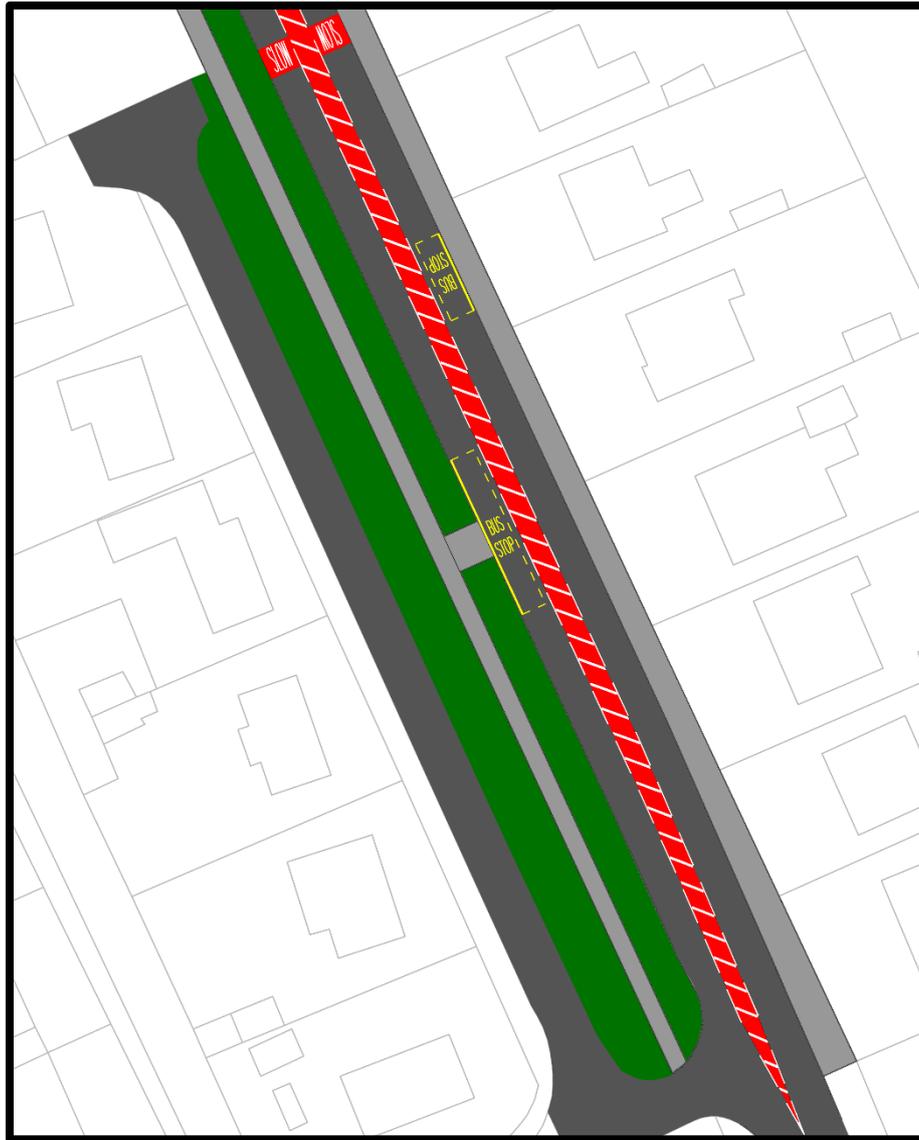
A78 Seamill, Existing Road Markings.
